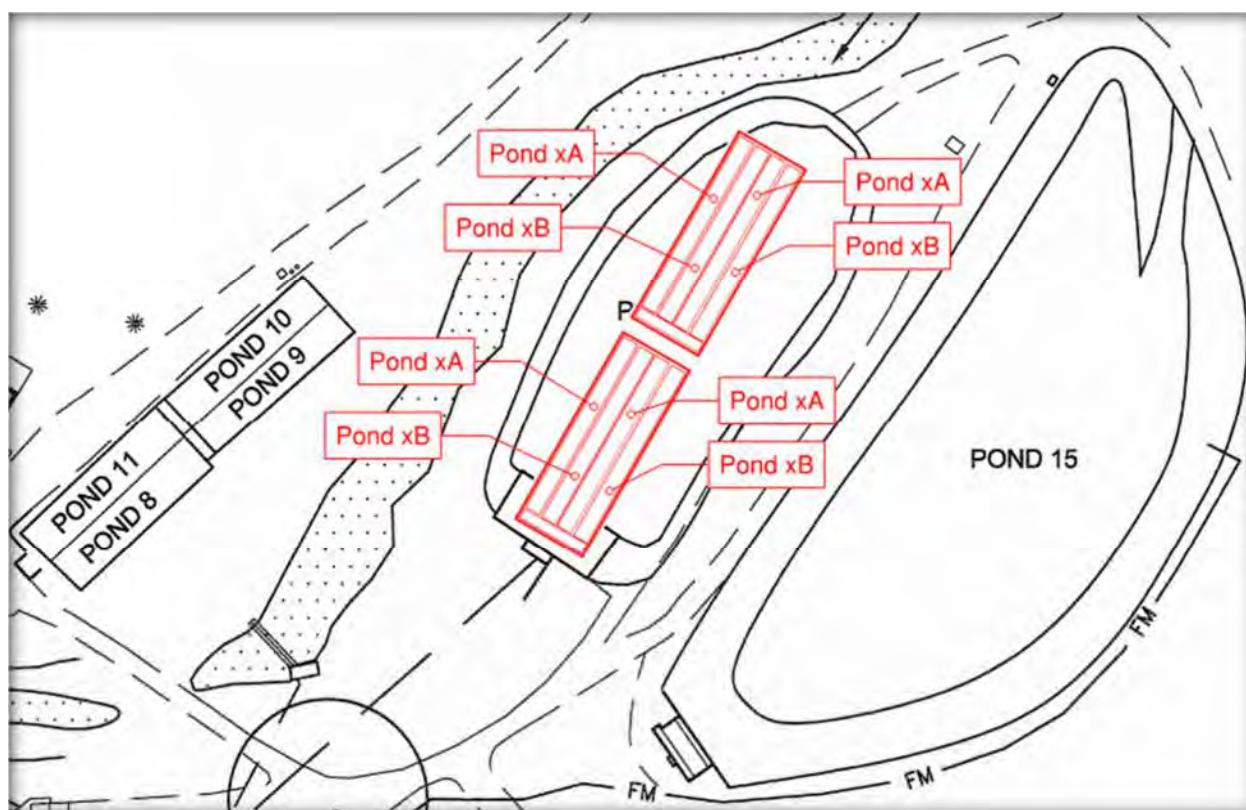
Cedar Creek – Proposed Raceway Layout (Ponds 8-11)
